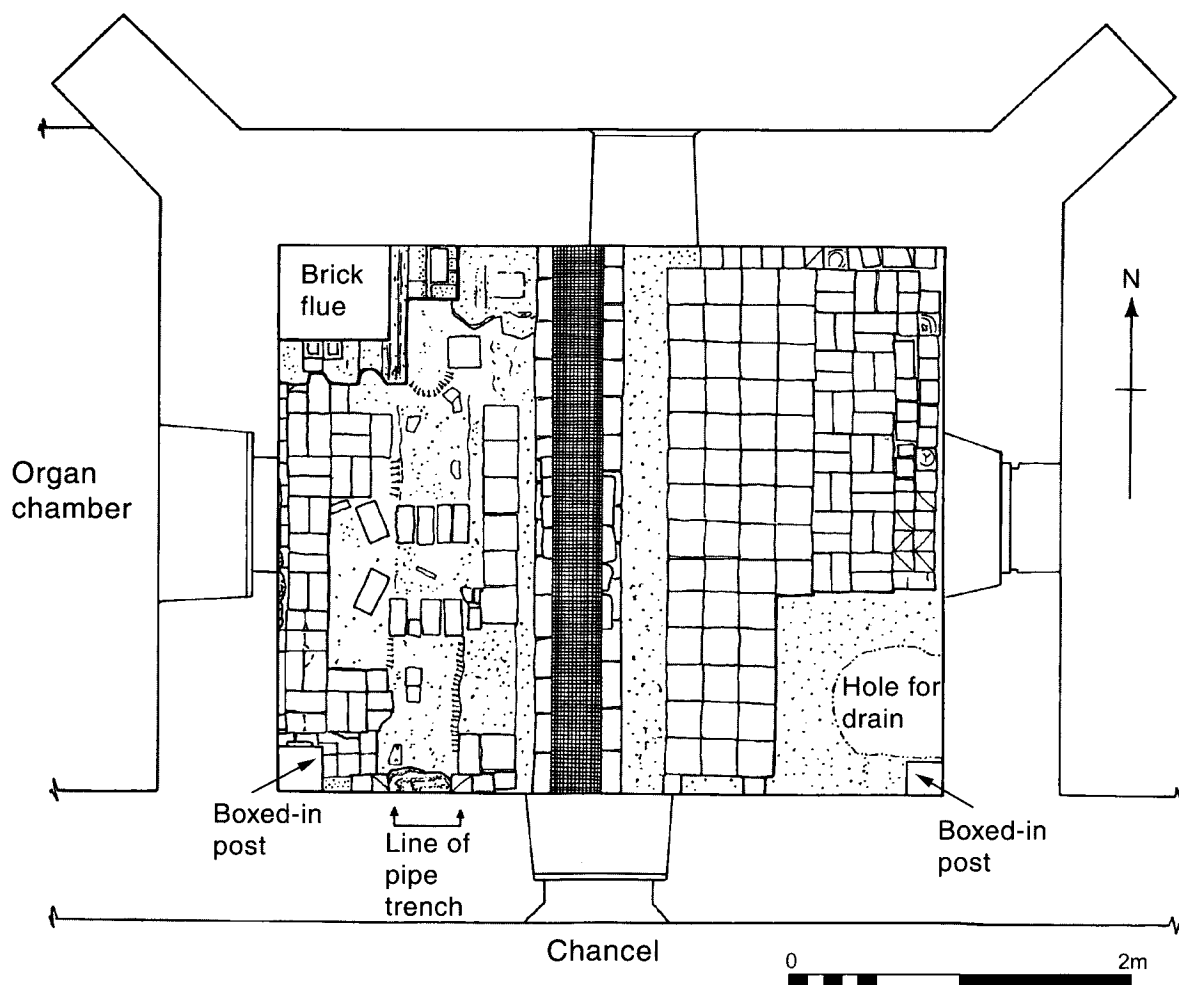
Sible Hedingham, St. Peter, plan of the vestry showing the 19th-century paved floor exposed beneath the boarded floor.
